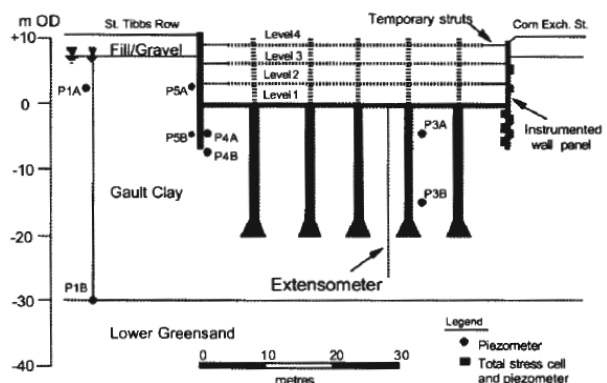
Basement layout and instrument locations, Nash et al (1996)
